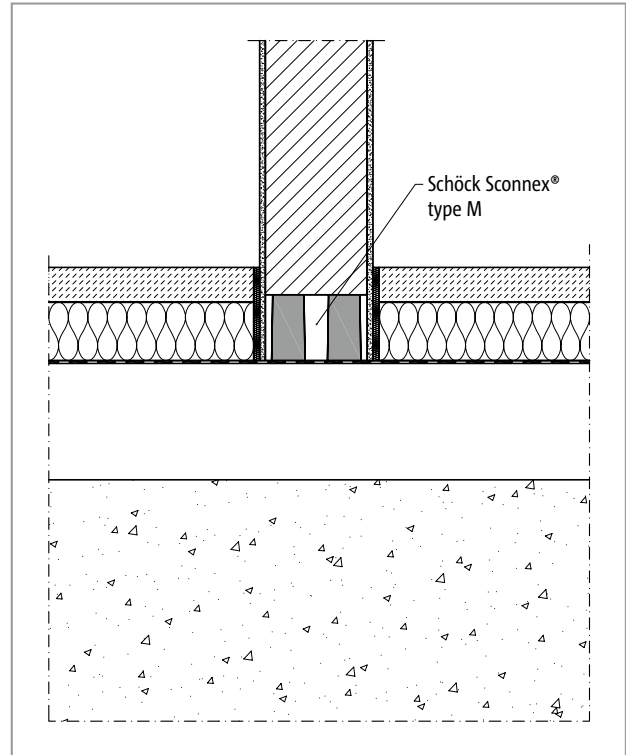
Schöck Sconnex® type M: Installation condition with internal wall and foundation slab
